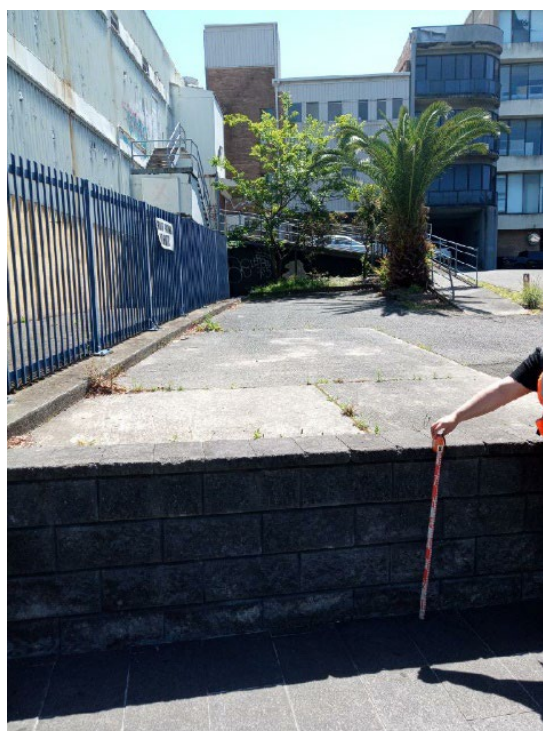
Existing buildings and slope within the southeastern corner of study area. View southeast.
